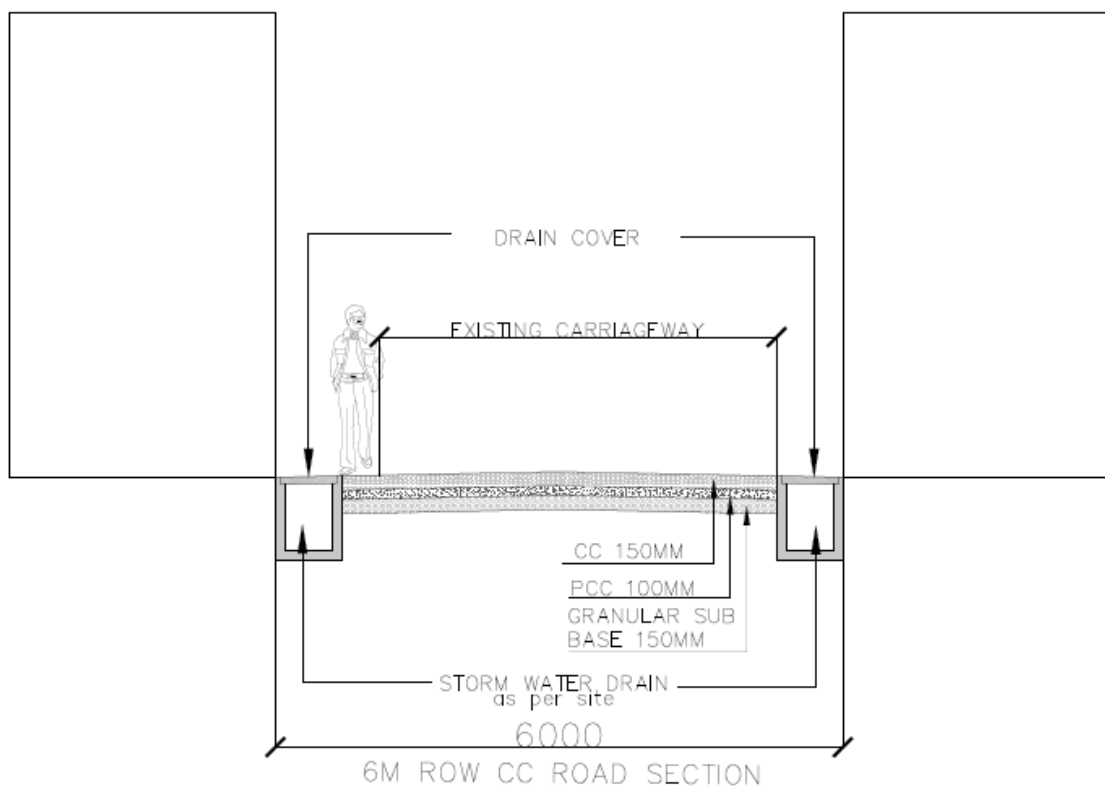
TYPICAL CROSS SECTION FOR CC ROAD CONSTRUCTION
